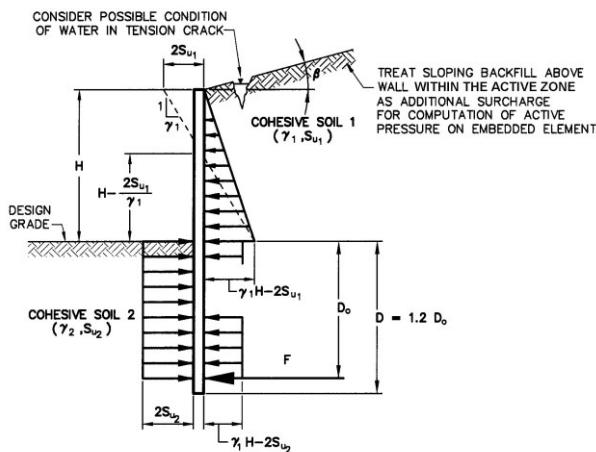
Unfactored Simplified Earth Pressure Distributions for Temporary Nongravity Cantilevered Walls with Continuous Vertical Wall Elements Embedded in Cohesive Soil and Retaining Cohesive Soil Modified after Teng (1962)
